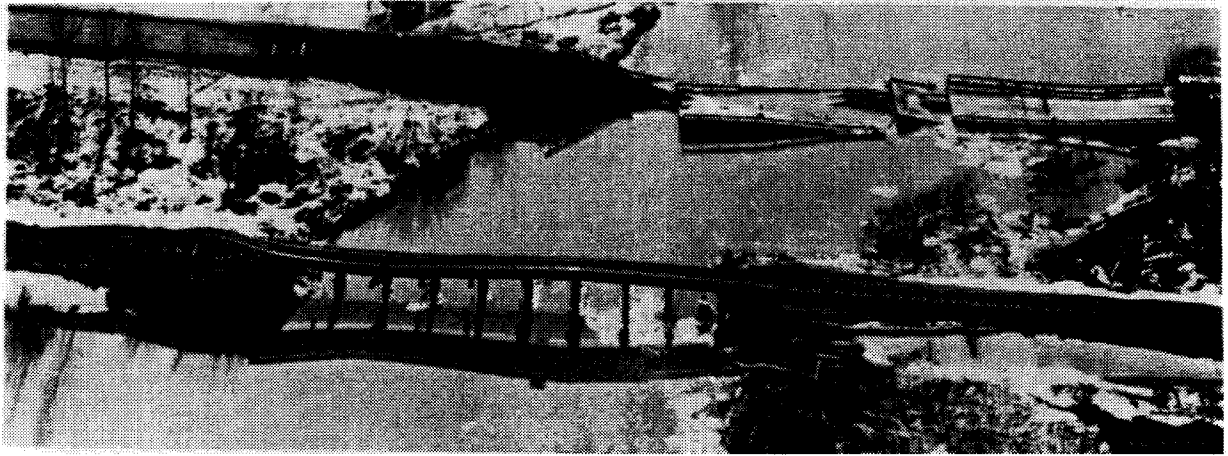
Collapsed bridge on the Seward Highway. Also track damage on approaches to adjacent railroad bridge. Prince William Sound earthquake, March 27, 1964.
